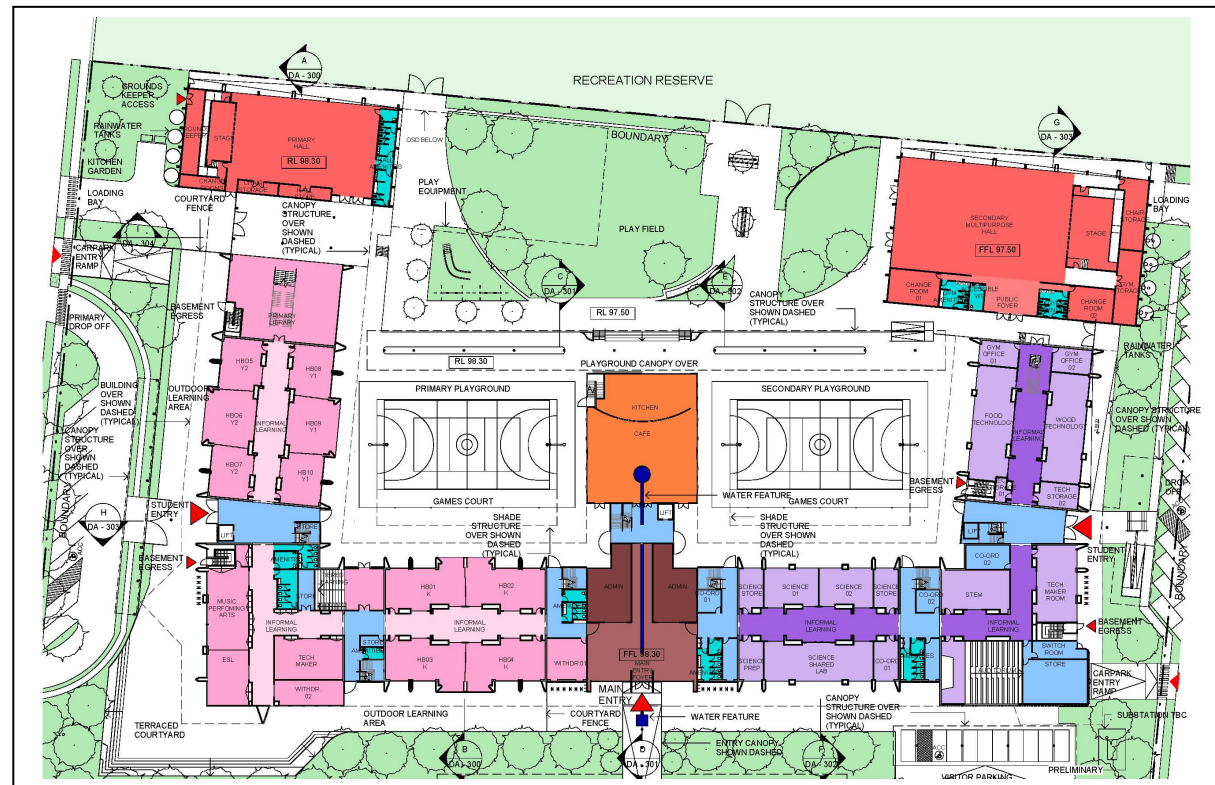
Ground Floor/Site Plan showing Primary and Secondary Playgrounds
